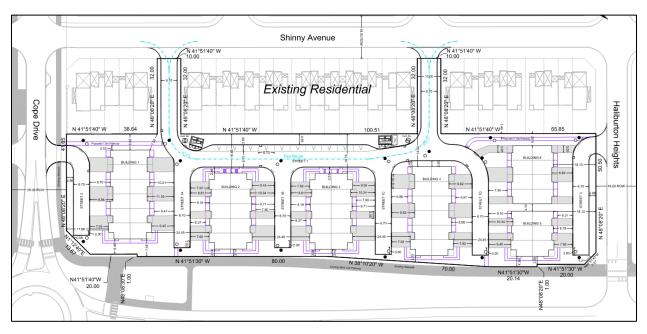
Excerpt of proposed Site Plan (see Appendix B for full plan)
